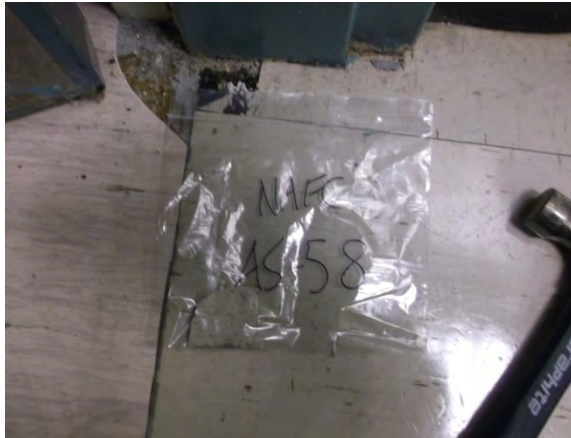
View of vinyl floor tile and mastic sample AS-58.
